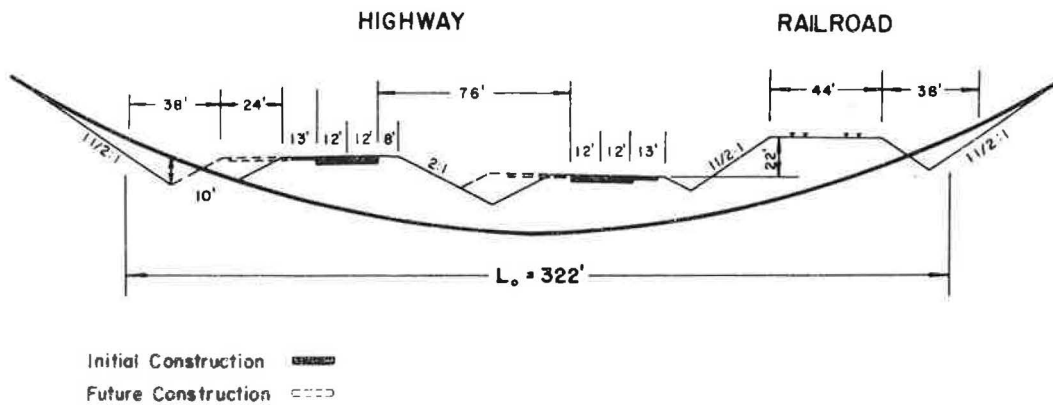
Typical cross section of final roadbeds proposed for Project Carryall.
